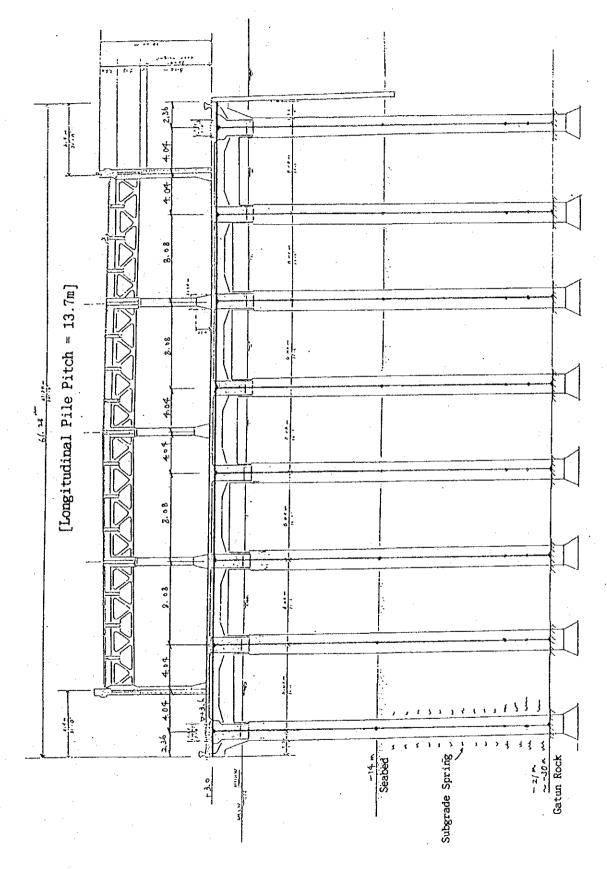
Typical Section and Frame: Pier No. 6
